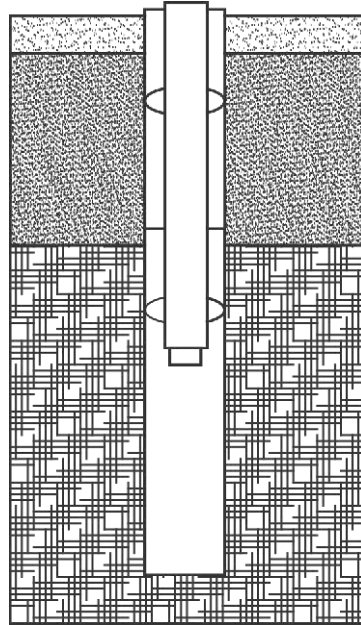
A gravity placement method of cement grouting well casing plugged casing lowered into cement slurry forces slurry into annular space.
